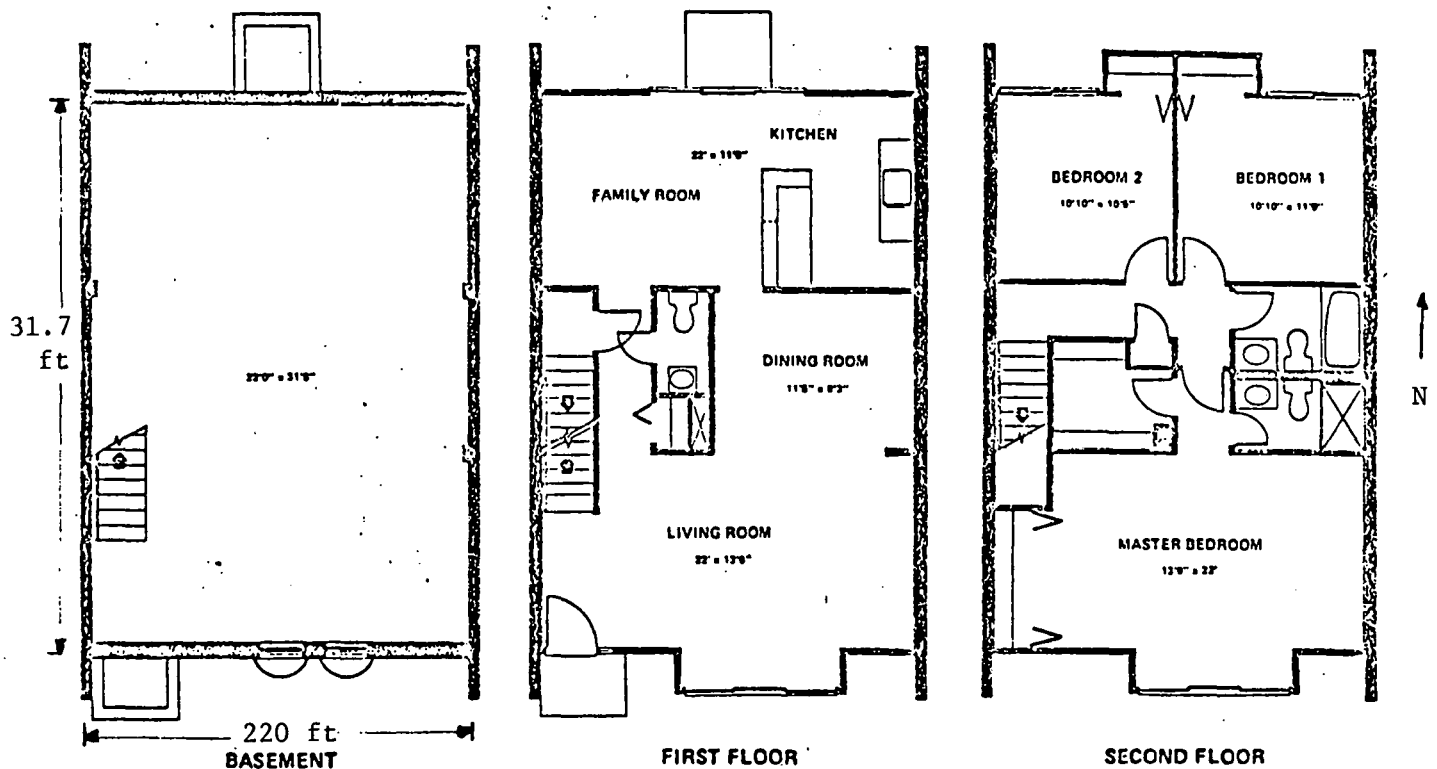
FLOOR PLAN FOR A 3-BEDROOM, 2-STORY TOWNHOUSE
